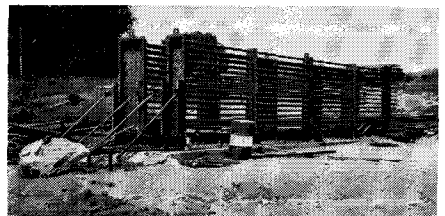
Markland Dam—83 Ft. Fabricated Bar Assemblies
